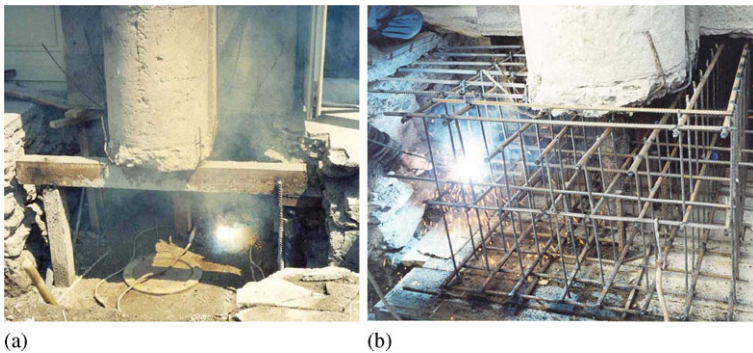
Temporary support under the one half of the existing column section (a), and existing column and the wall behind it are supported temporarily and the reinforcement frame of the upper pedestal is installed (b)
